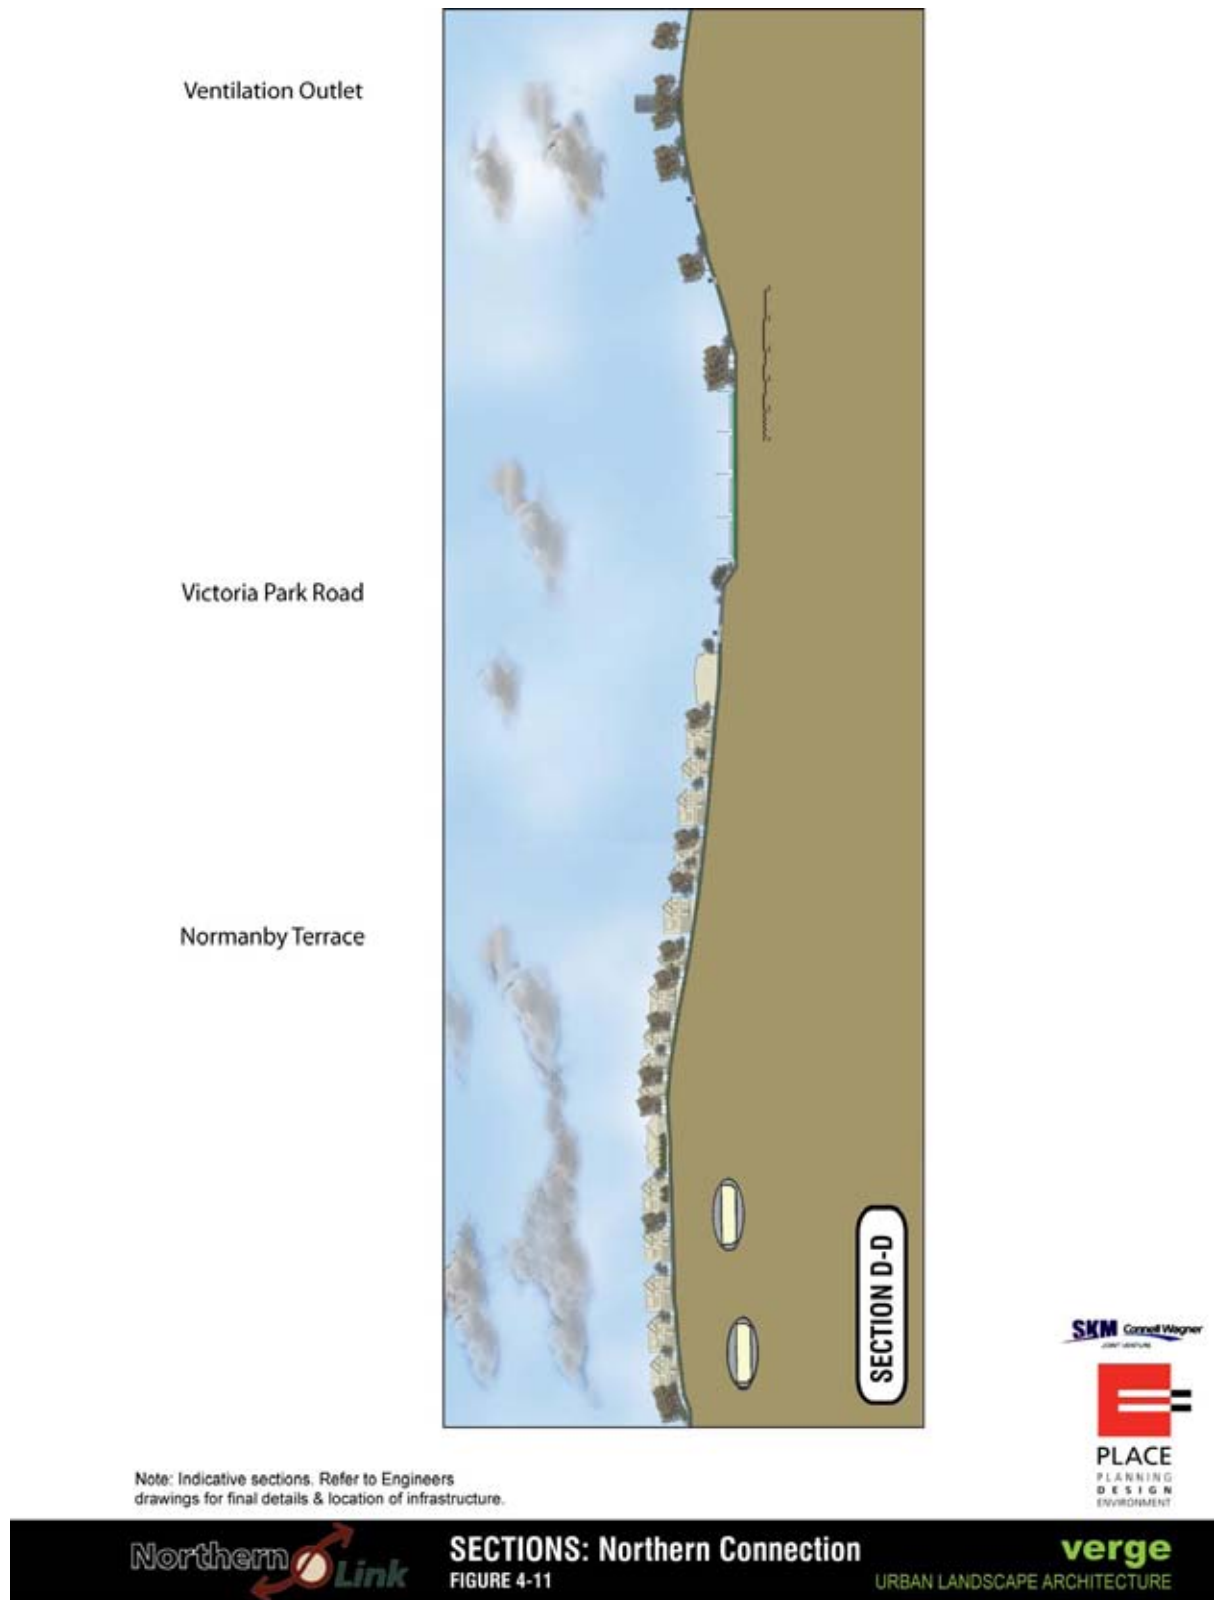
Urban and Landscape Design Section – Northern Connection
